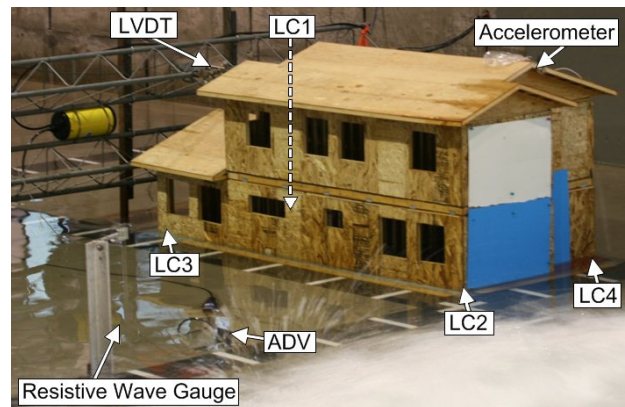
Fully assembled structure with instrumentation in the tsunami wave basin.
